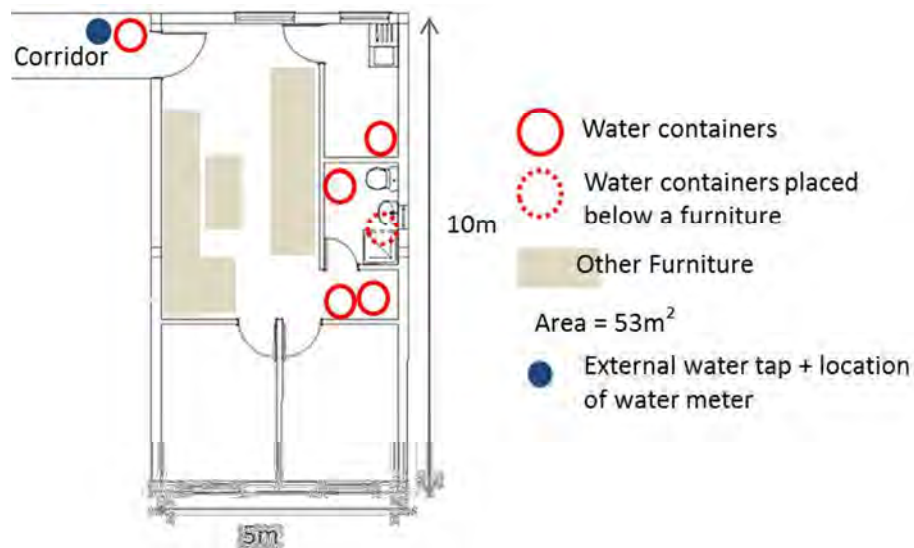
Layout of Guae's house in relation to the different water storage space
